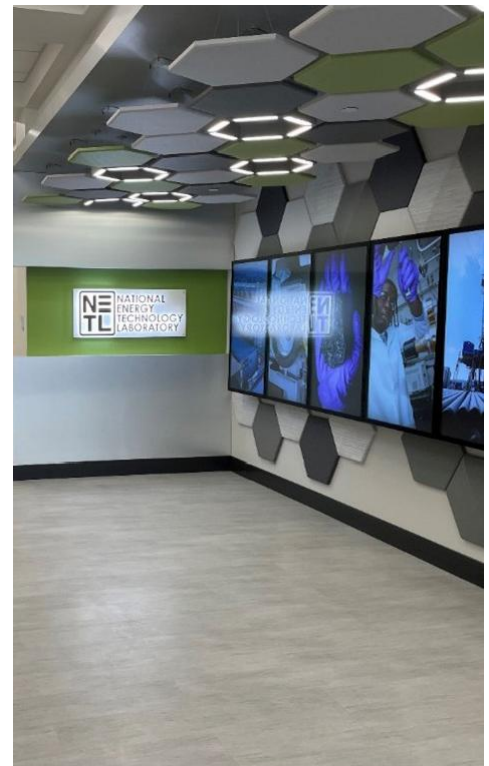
B-922 conference center — hallway after renovation.
